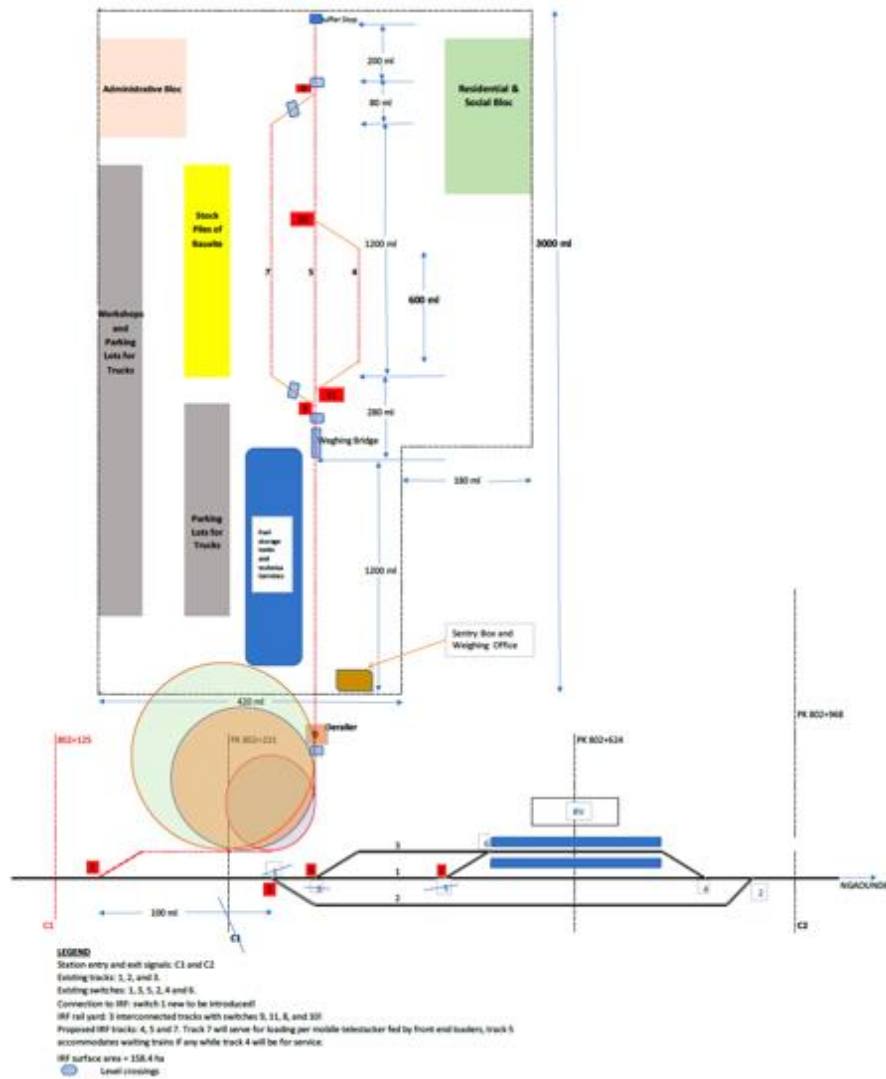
Schematic of Makor railway station and proposal for IRF rail equipment
